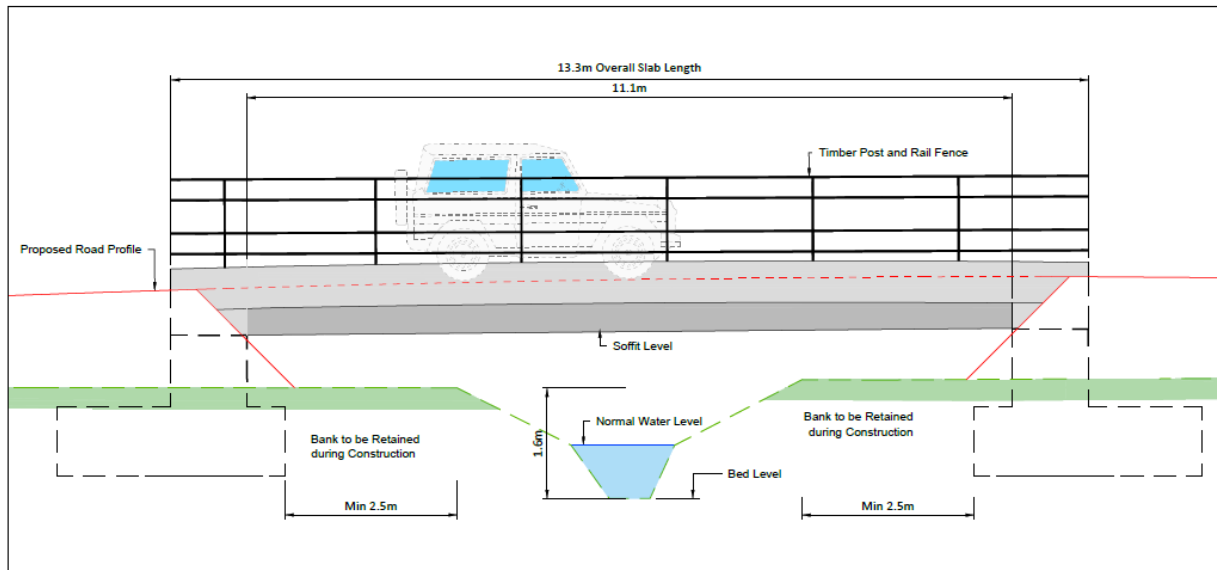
Excerpt of Drawing No. P2359-1700-0001– ‘Typical Stream Crossing Details’.
